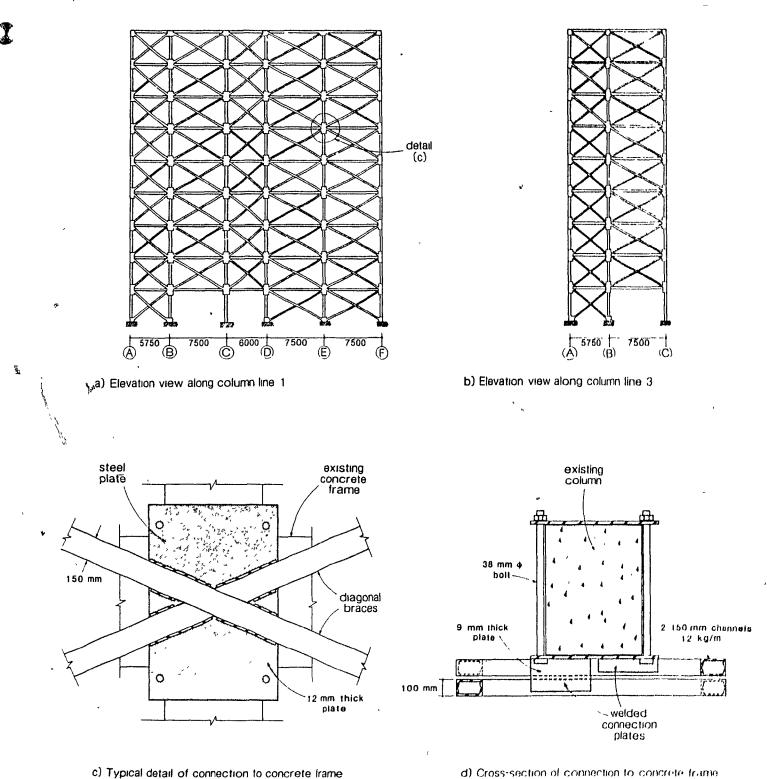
Strengthening of Nine-Storey Office Building Showing Continuous Cross-Bracing. (Photograph courtesy of Octavio Armengol).
